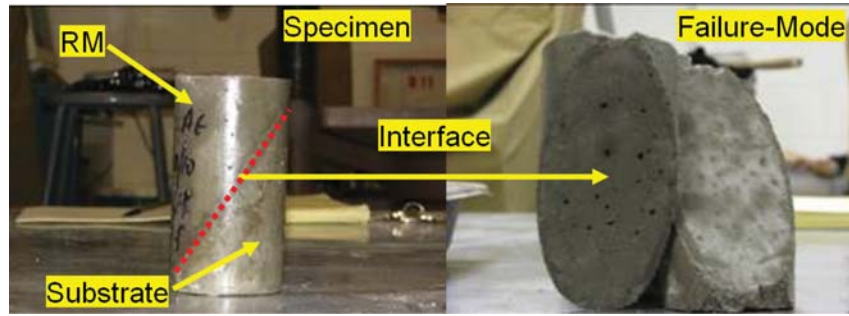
Slant-shear bond test—specimen and failure mode.
